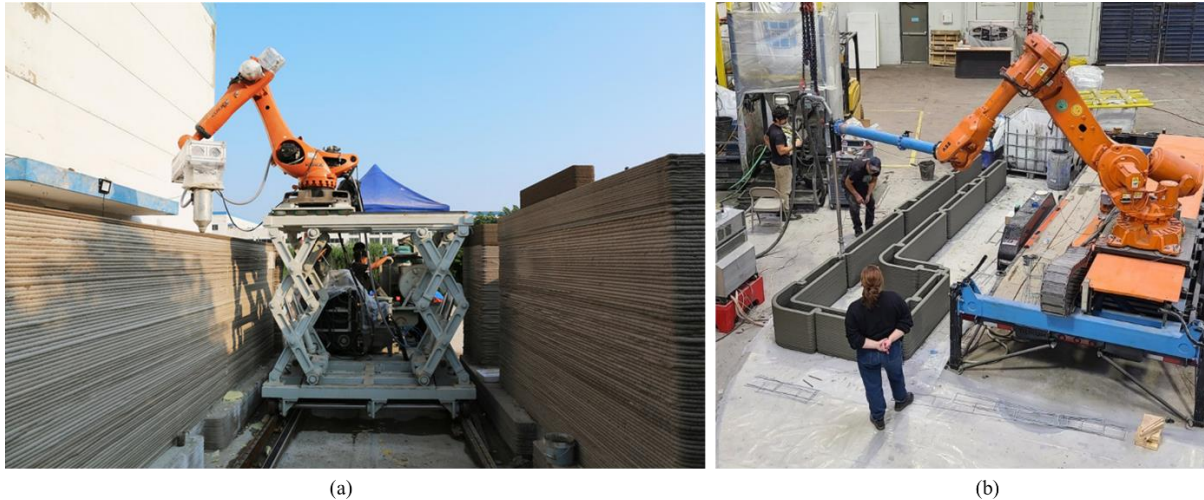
On-site (a) and off-site (b) 3DCP construction using robotic arms. Source: CyBe Construction.
